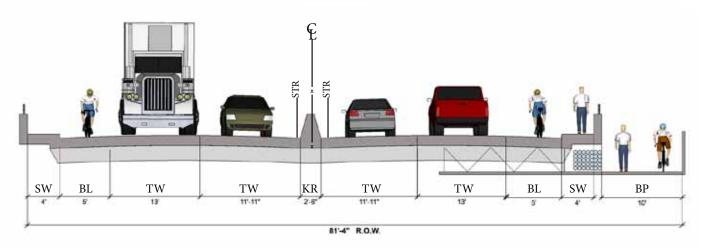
Overview of Project Improvements Looking North from 32nd Street
